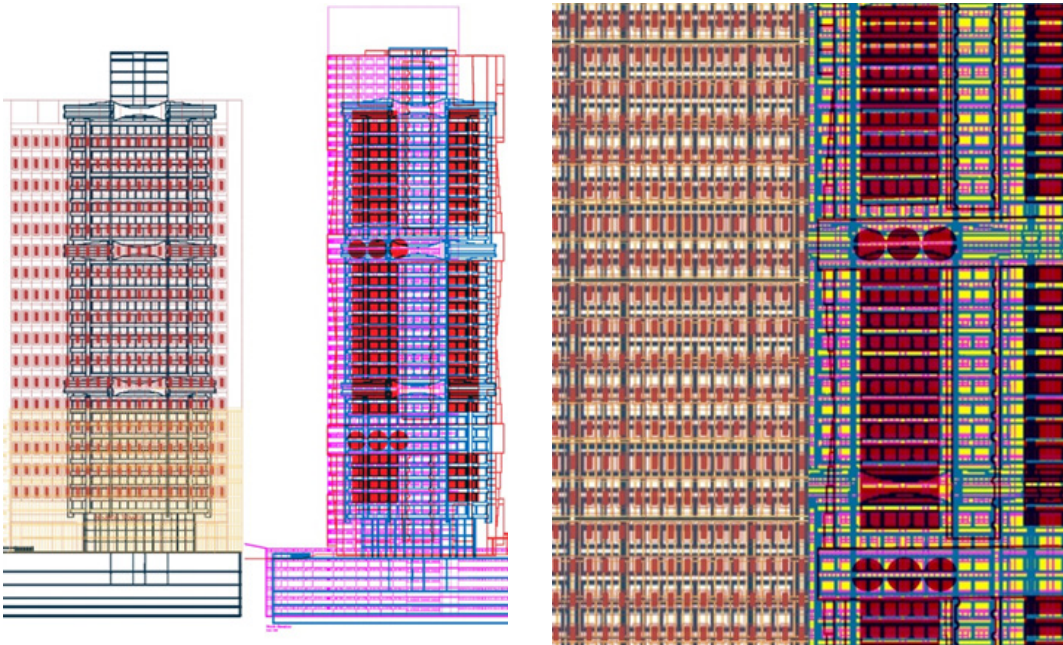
Marco van der Bank, Standard Bank (1970), Unisa Building (1968) and Penmor Tower (1974) elevations superimposed, Gauteng, South Africa, TUT Department of Architecture and Industrial Design, 2022.
